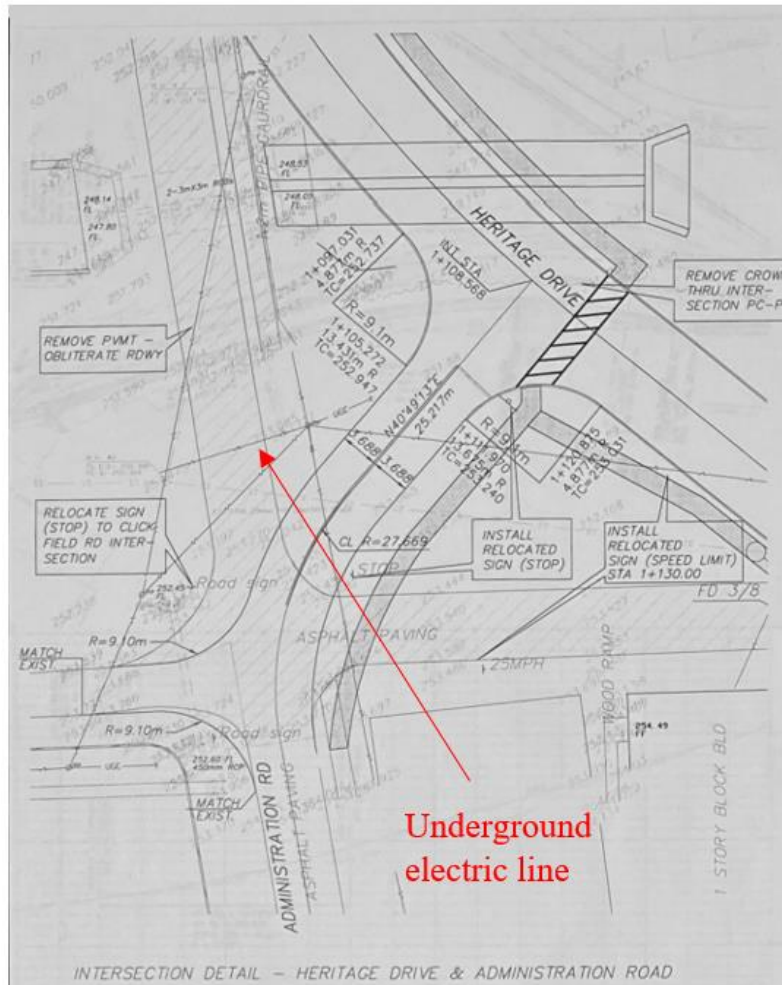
Plan view of intersection from Pawnee Nation's Roadway Plan Set
